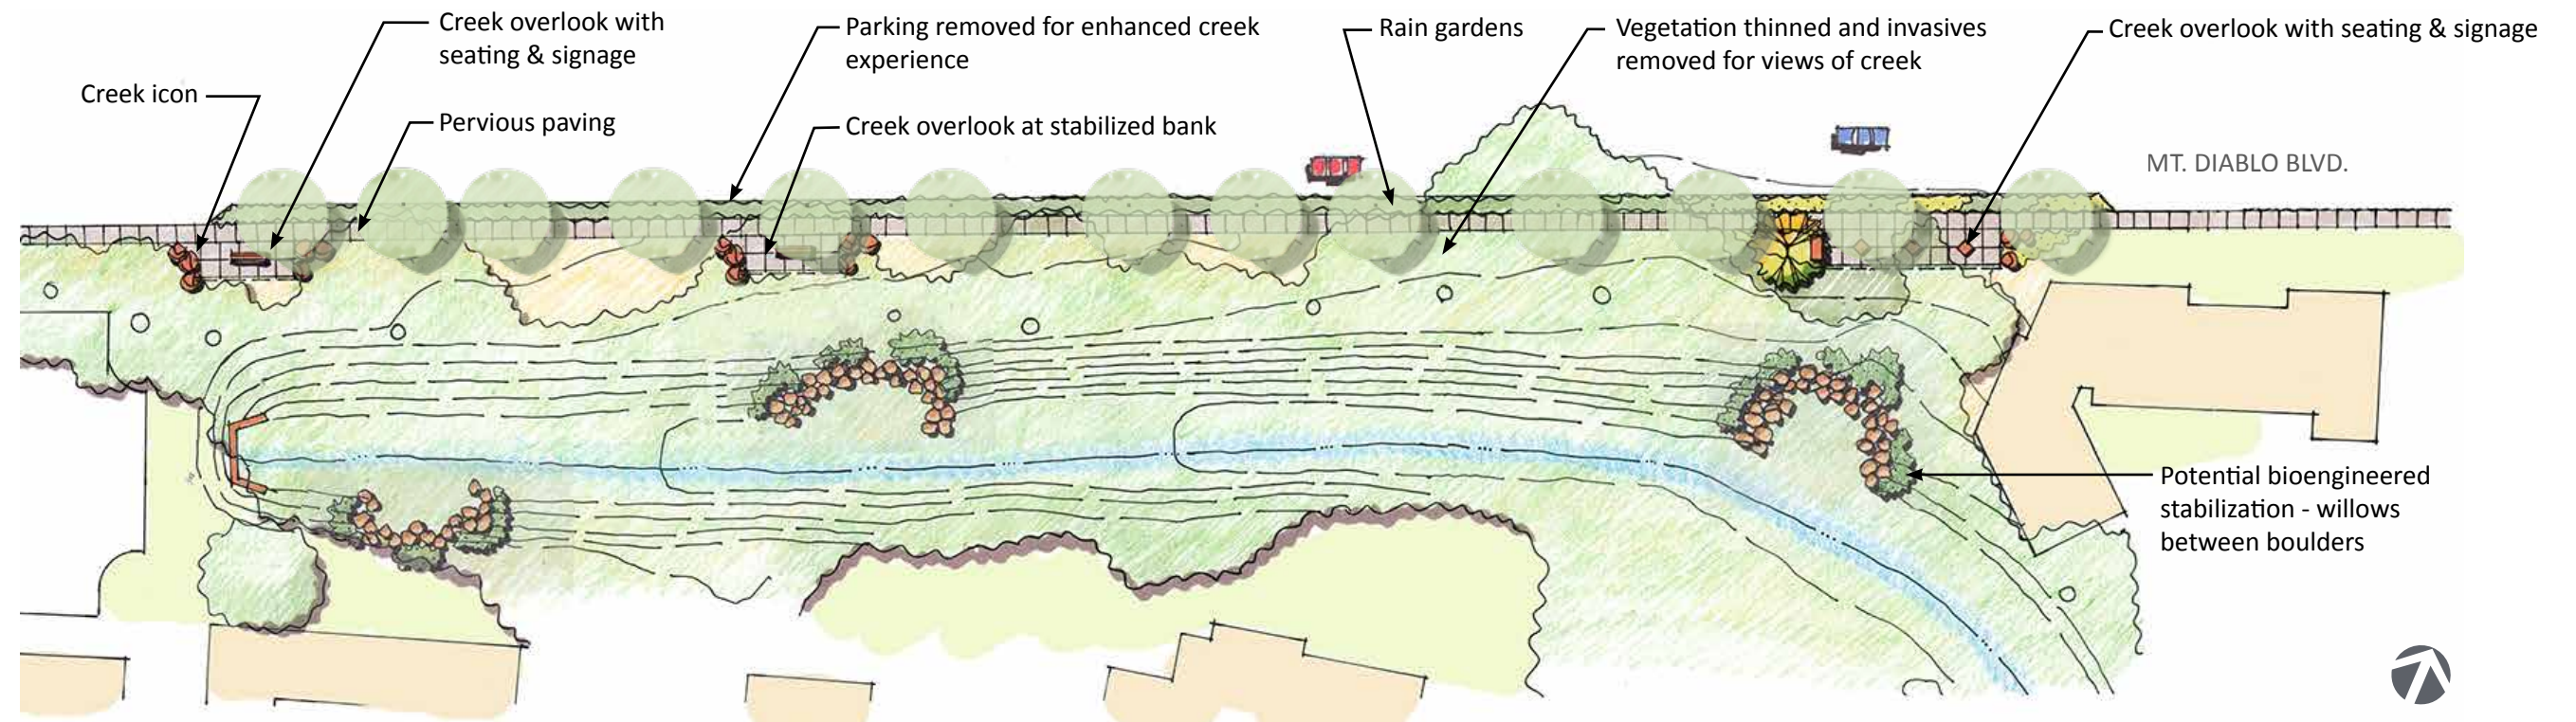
Plan view - Creek overlooks, rain gardens and pervious paving along Mount Diablo Boulevard
